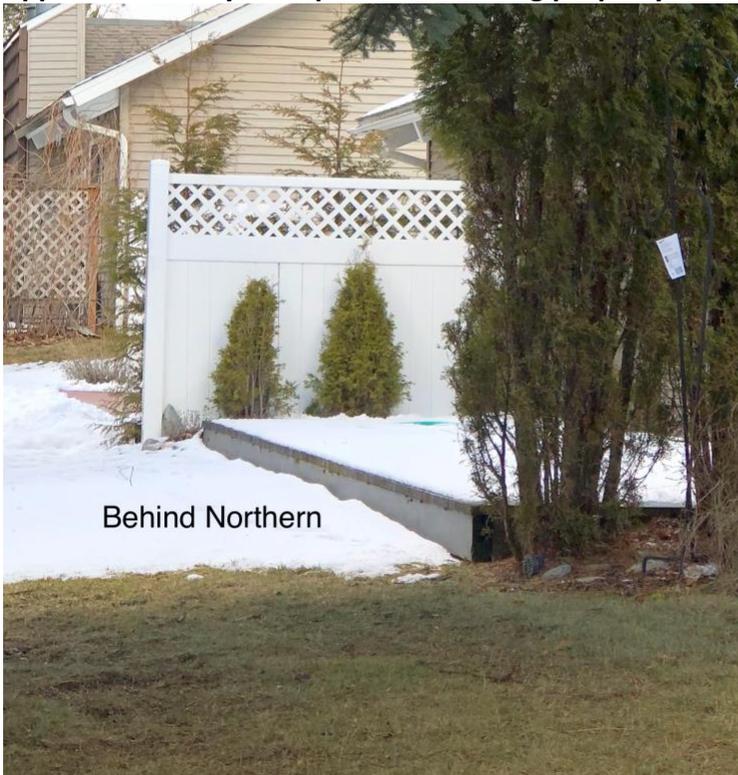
Design of Lindholdt replacement privacy screen, approved.
